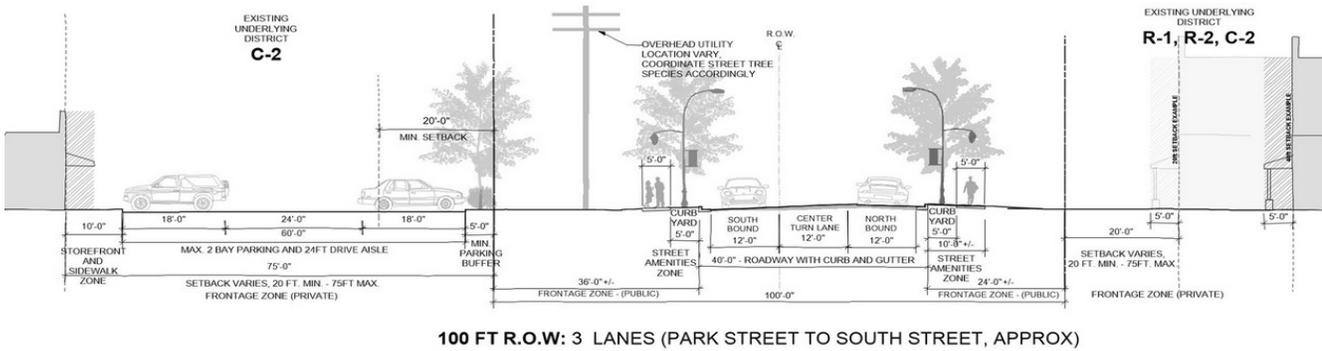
COD-G: Typical Cross Section - Parking In Front of Development and Future Streetscape Elements
